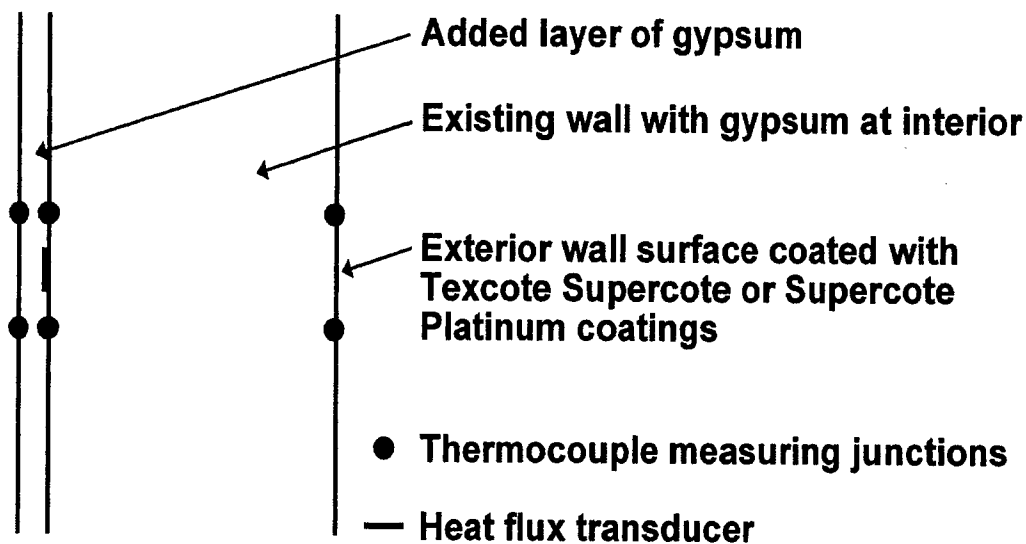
Arrangement of Instrumentation and Added Gypsum Layer to Comprise Test Sections at Each Site
